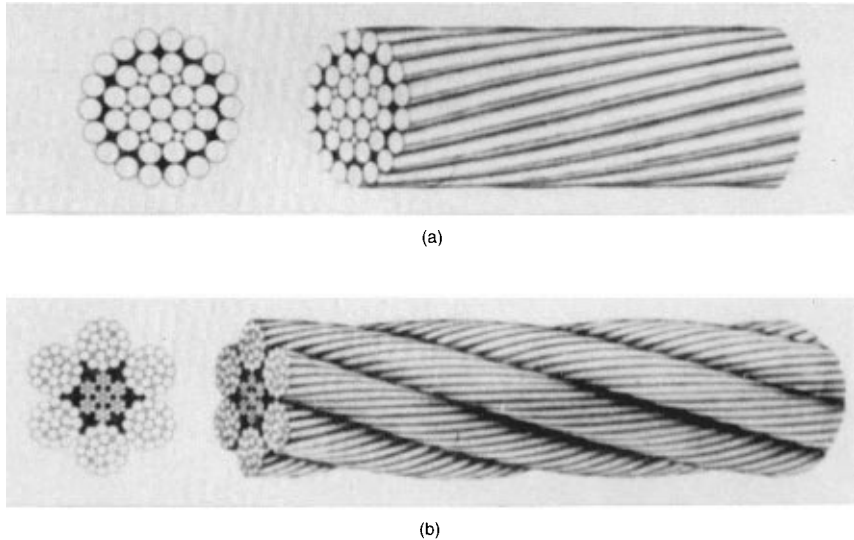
Configuration of (a) structural strand and (b) structural rope. (Reprinted with permission from J. B. Scalzi et al., "Design Fundamentals of Cable Roof Structures," ADUSS 55-3580-01, U.S. Steel.)
